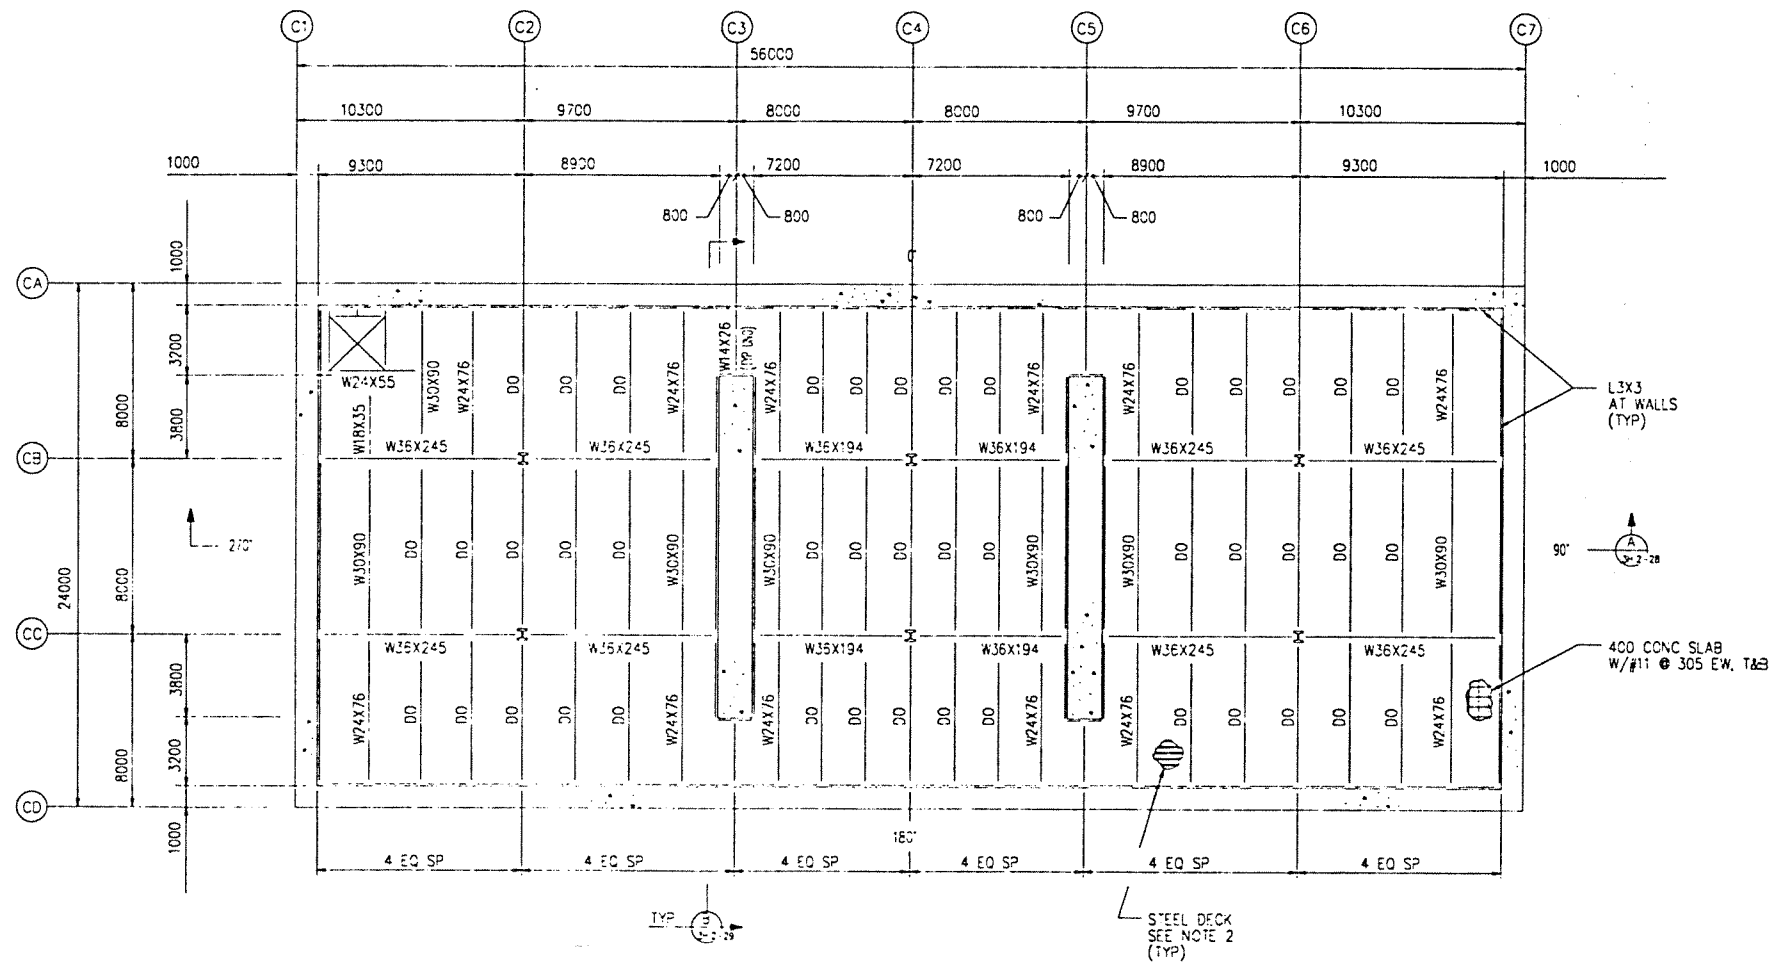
H.2-22 CONTROL BUILDING-FRAMING PLAN AT ELEVATION TMSL -2150 mm
